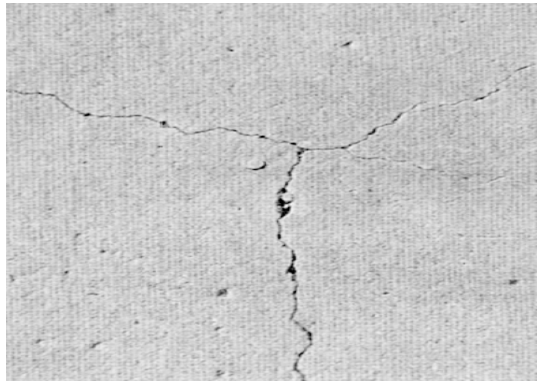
Drying Shrinkage Cracks due to Improper Joint Spacing.
